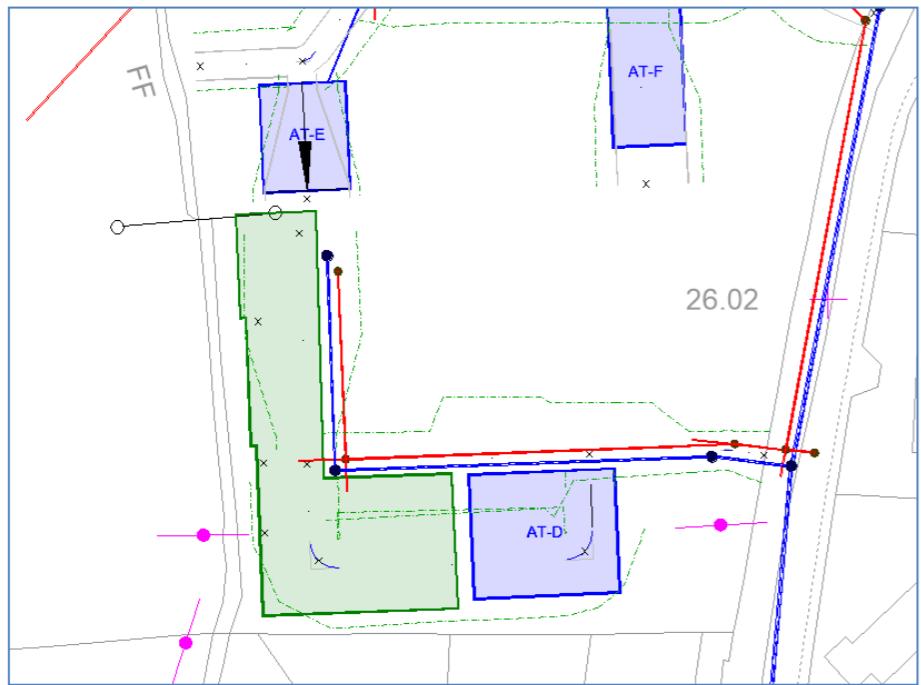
Location of proposed flood water storage tank (1200m³)
